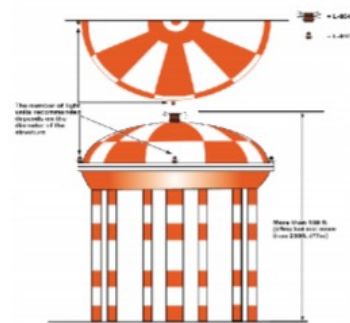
Painting and Lighting of Water Towers, Storage Tanks, and Similar Structures
